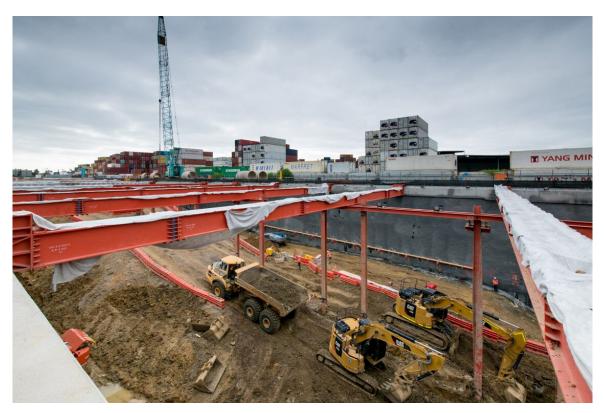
North Portal bulk excavation and temporary support – Tunnel Zone (Source: WGTA, 19 February 2019)
